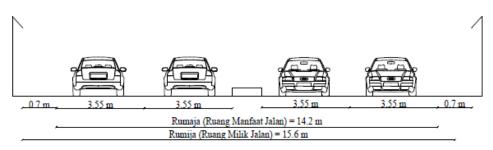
Cross Sections of the Mayor Suryotomo Street
